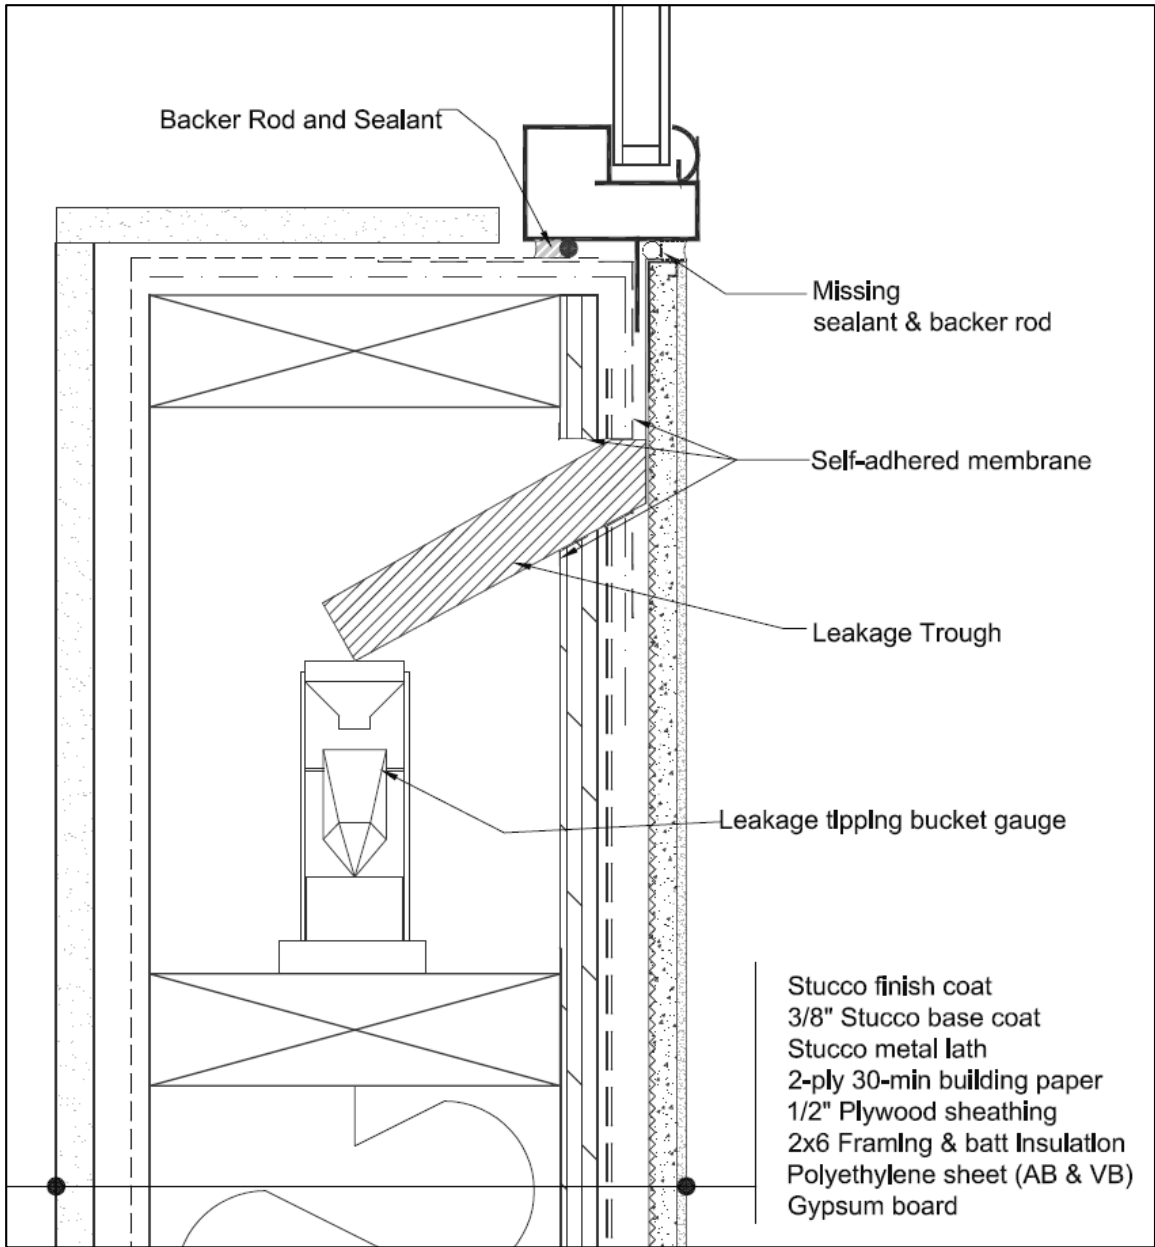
Detail drawing of water collection stucco wall W6 with missing sealant defect. The wall assembly cross section is typical for all stucco walls.
